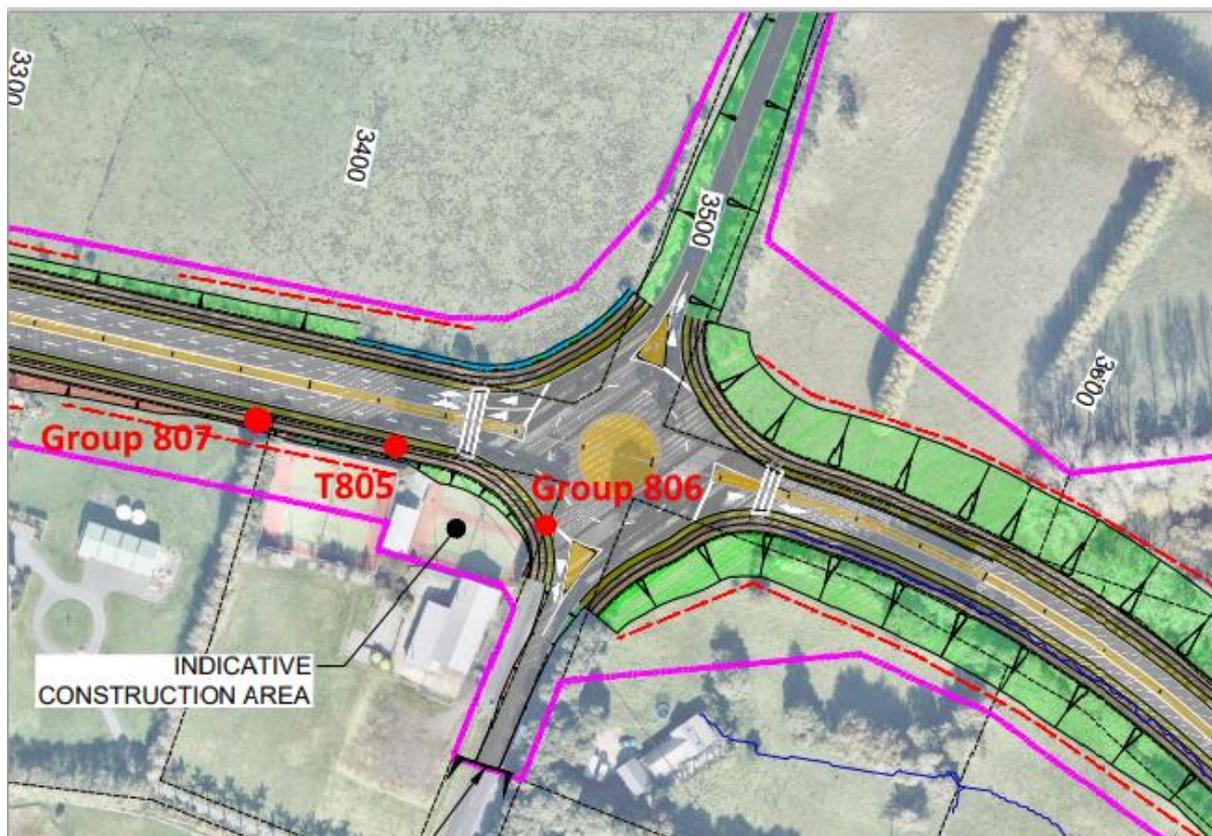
Proposed construction area and road layout at 4 Postman Road showing tree locations.
